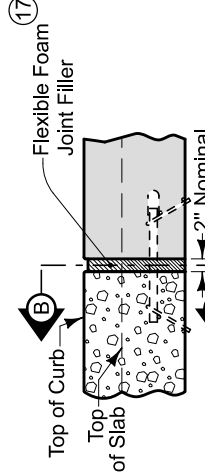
Detail F or Detail G (See Bar Size Table for Doweled Expansion Joints)
